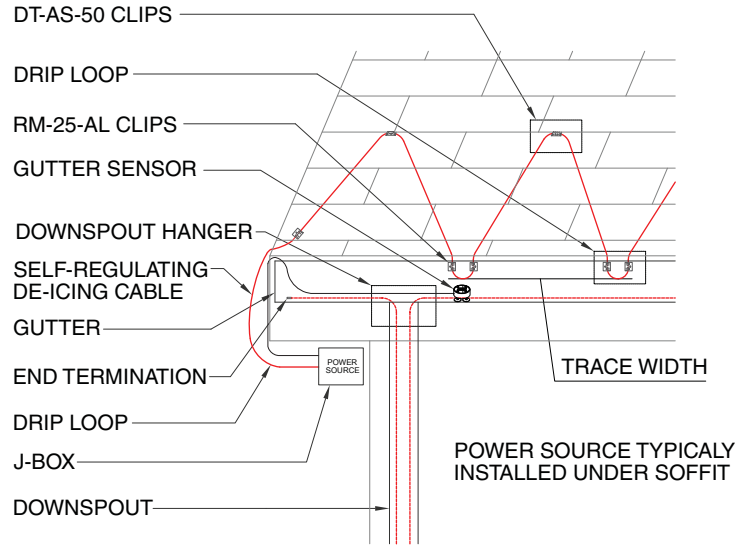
De-icing cable on sloped asphalt eave only. This layout typically uses DT-AS-50 clips with SB-190 adhesive on roof, and RM-25-AL clips with VHB adhesive pads for drip loop in gutter.
